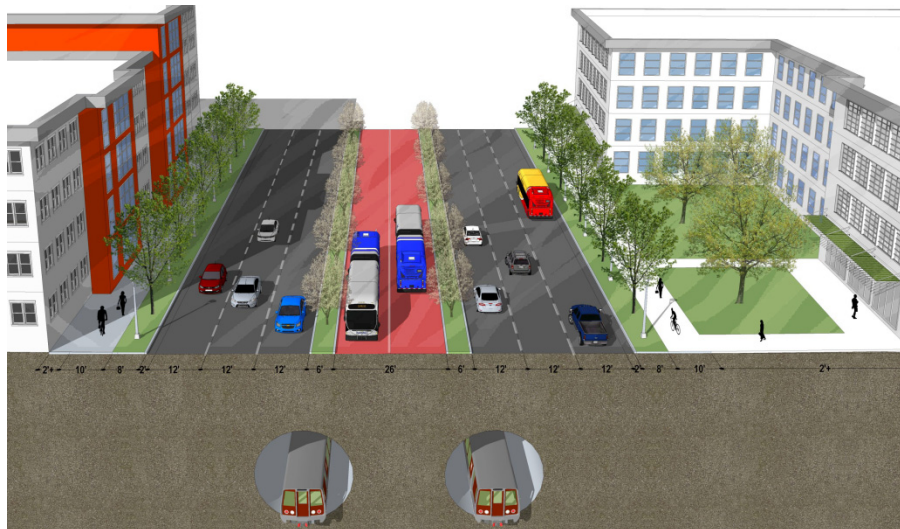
Alternative 4: Metrorail/BRT Hybrid – Underground, Typical Section (Yellow Line Extension)
